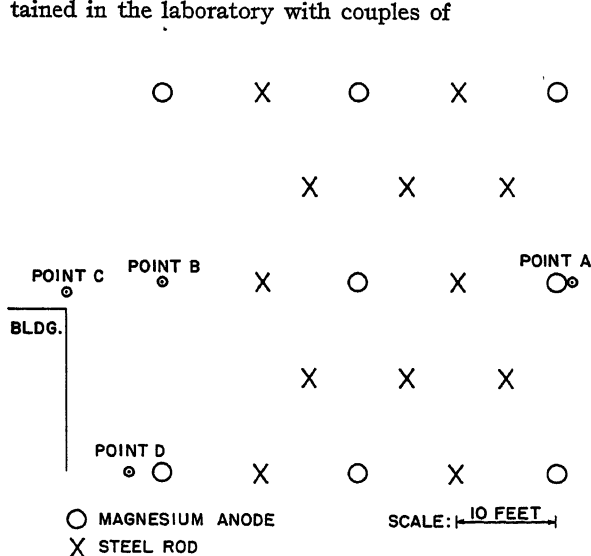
(left). Ground bed at northwest corner of raw coil storage building showing location of soil-potential tests
